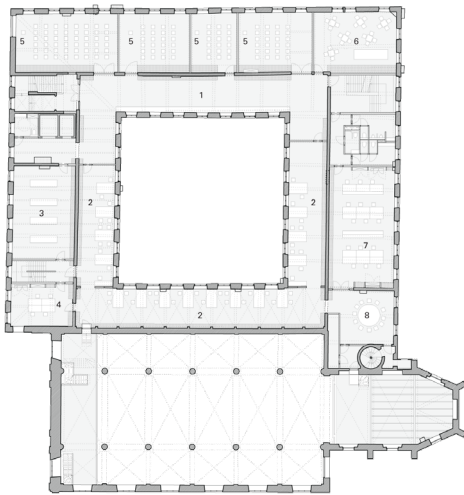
| Plans of the ground floor of Predikheren (Korteknie Stuhlmacher Architecten, 2019)
